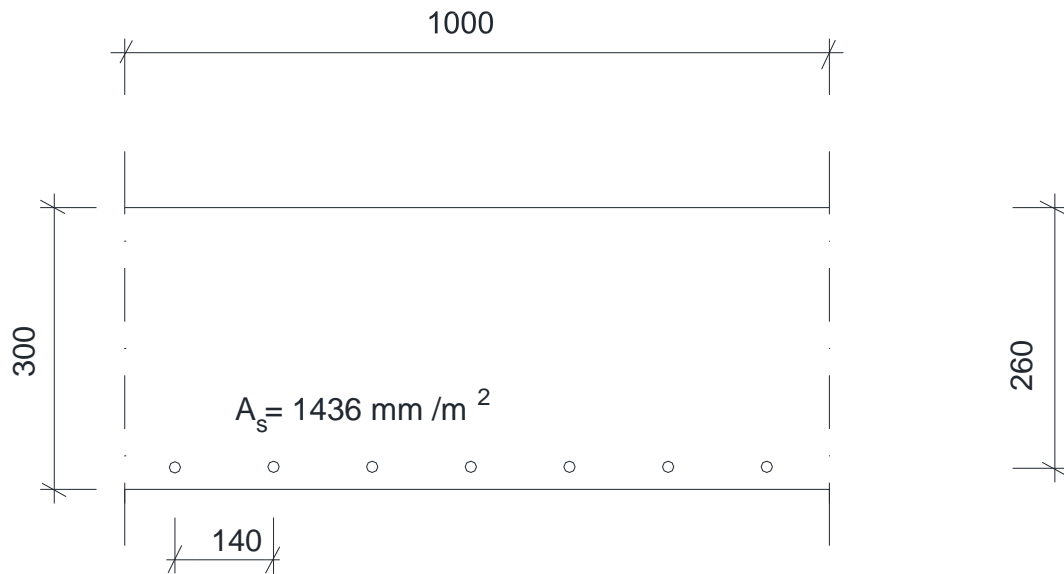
Cross section and dimensions of a transverse mid-strip for design of the bridge deck.
